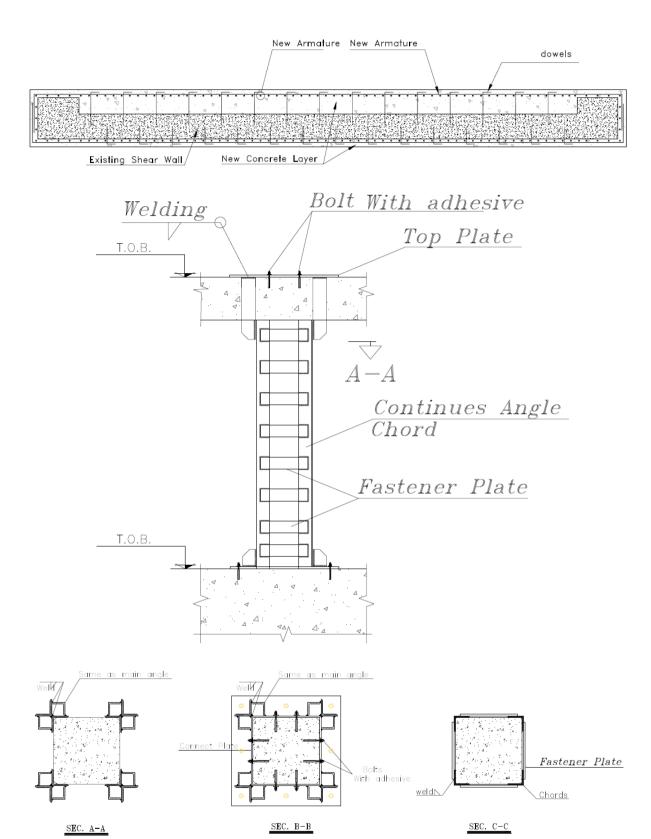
samples of some provided retrofitting detail drawings for structural elements
